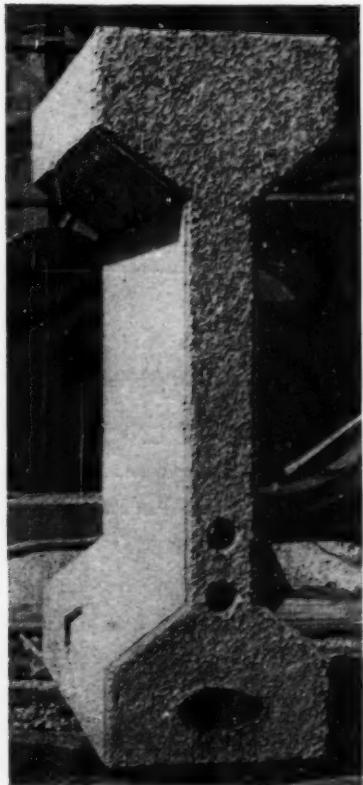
Precast Block with Bush-Hammered Face, showing Cable Ducts.
